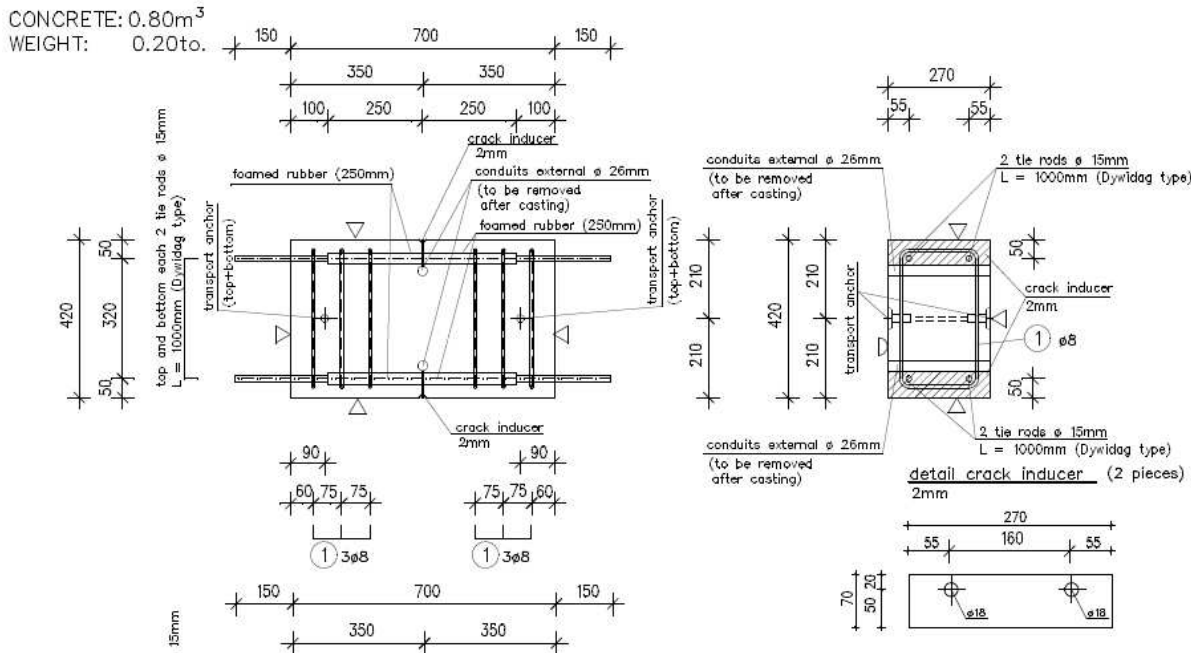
Special concrete test specimens used for cyclic crack tests
